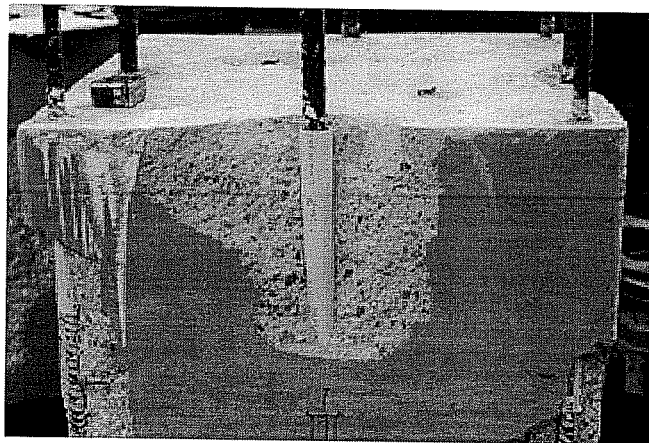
Bearing Failure of Loaded Surface
